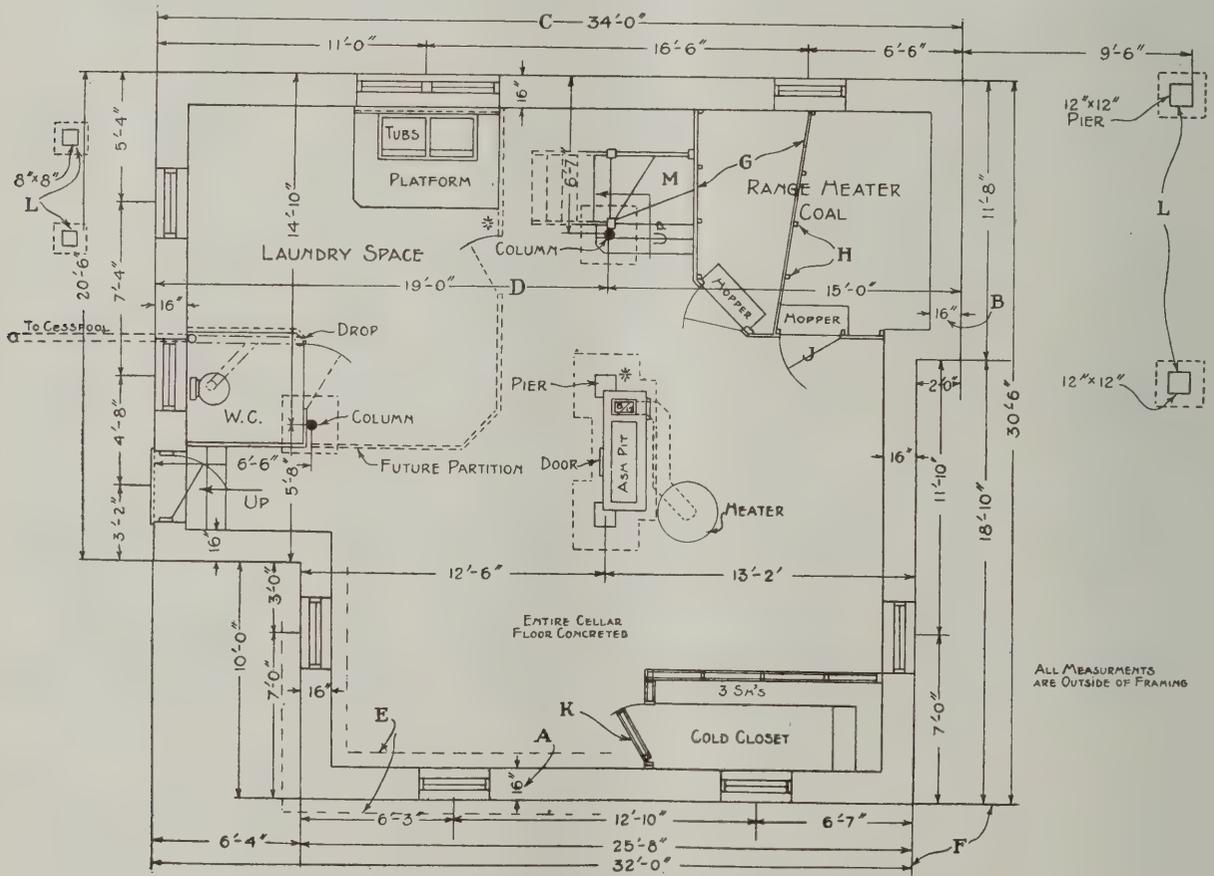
Plan of Foundation and Cellar—Scale 3/8 In. to the Foot
